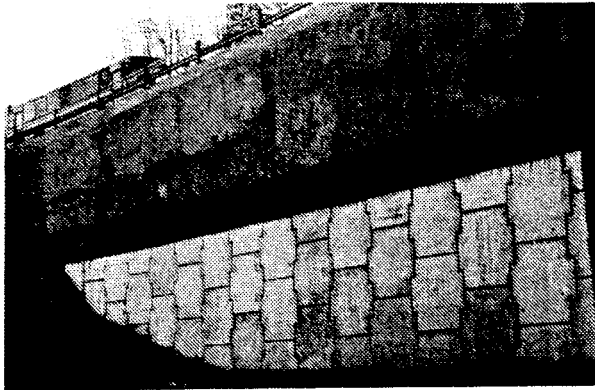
Vertical EPS wall. Road no.181 at Eidsvoll, Norway.
